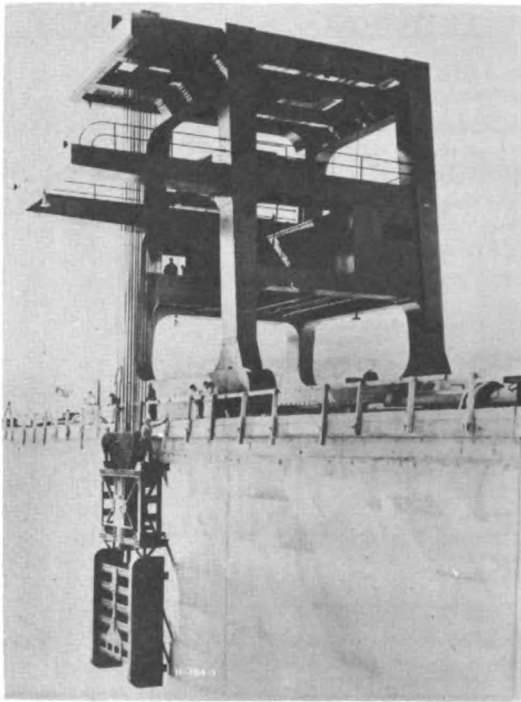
Coaster gate and handling equipment for river outlets, Shasta Dam
